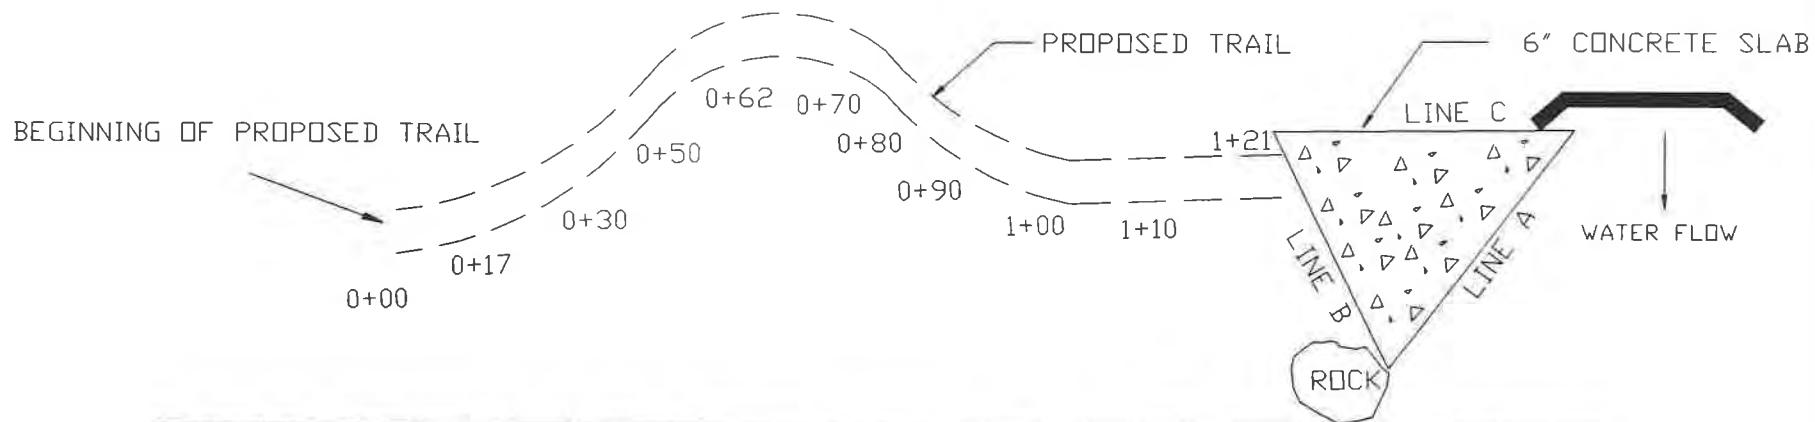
PLAN VIEW OF ELEVEN MILE FISHING DOCK SITE
